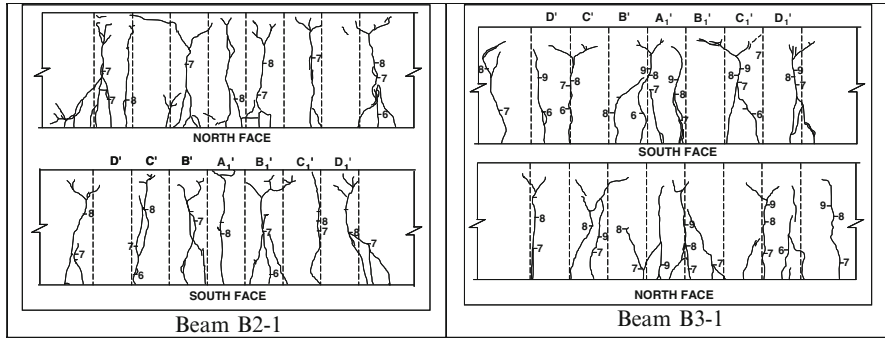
Observed crack pattern for beams B2-1 and B3-1 (numbers denote the loading stage)
